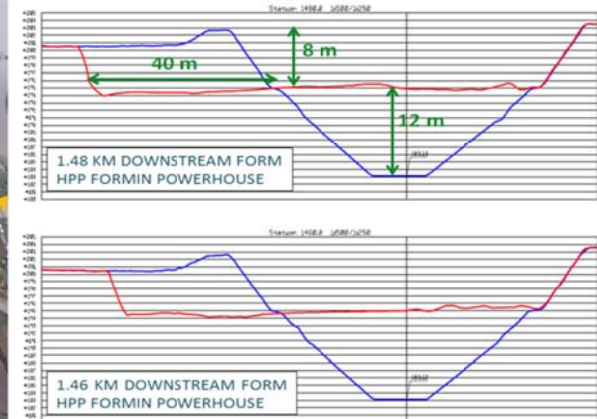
Upstream levee breach of HPP Formin outlet canal
